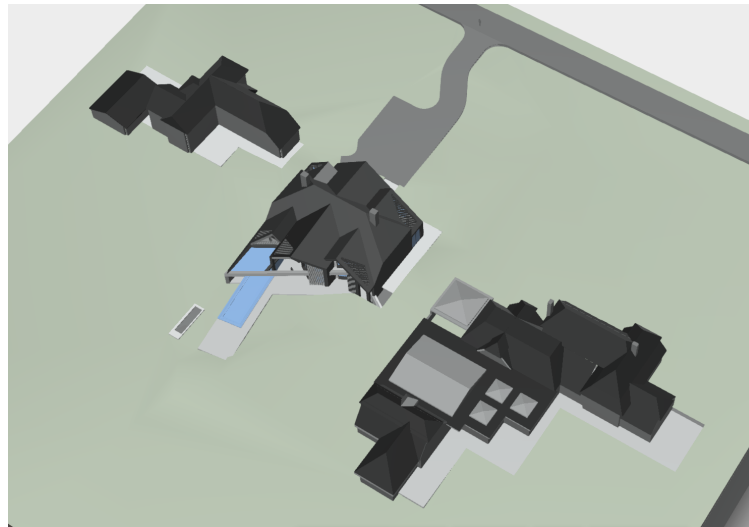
3D View of Tanglewood as proposed and its neighbours: Hip Roof with a cat-slide pitch on the rear elevation
